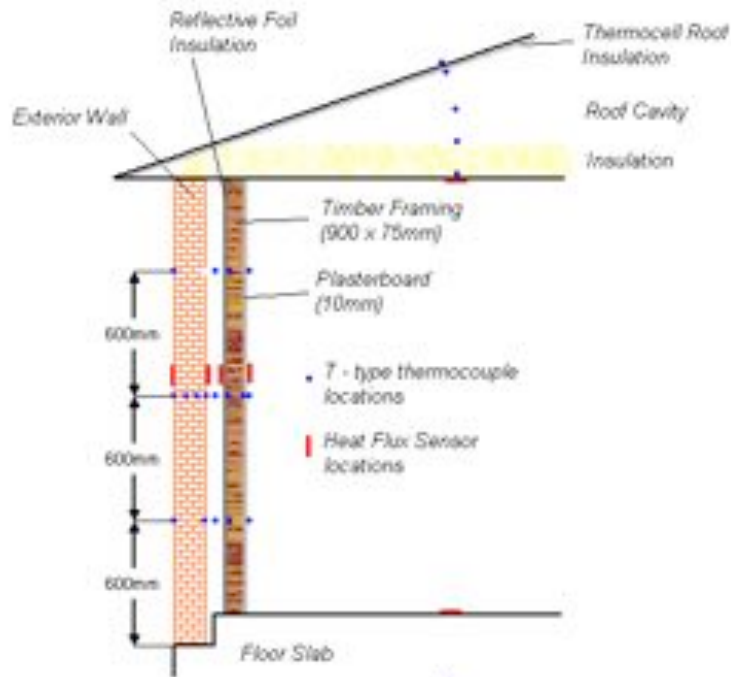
University of Newcastle Test Building: Detail of Clay Brick Veneer Wall
